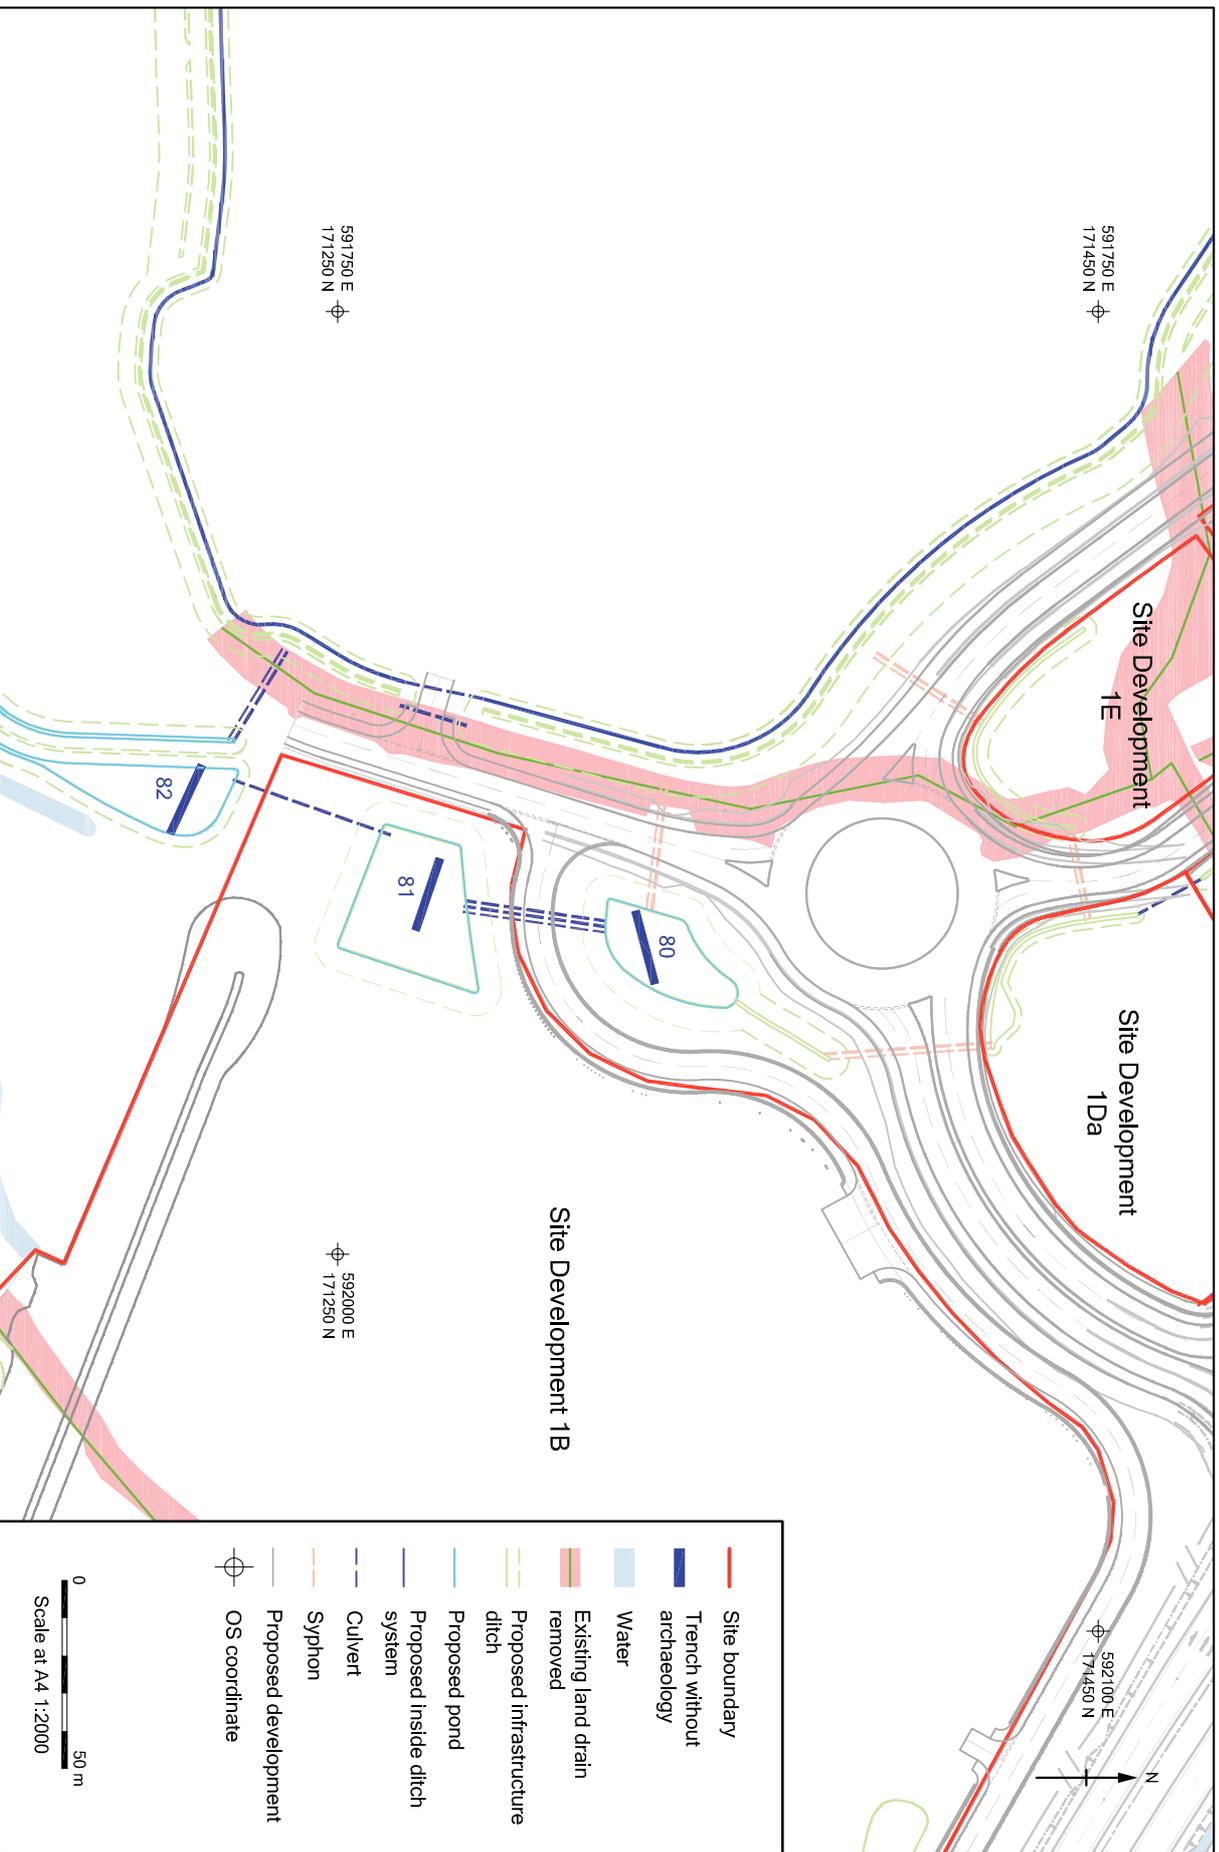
Additional trench location plan - Neatscourt Phase 1 Ponds
